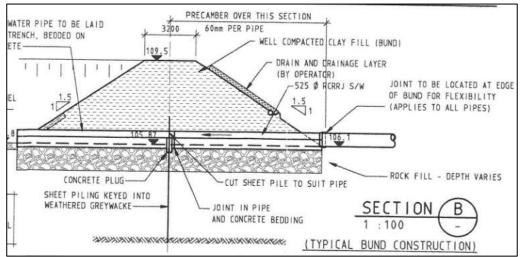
Typical bond construction and sheet pile detail (Courtesy of Royds Consulting Limited, 1995)
